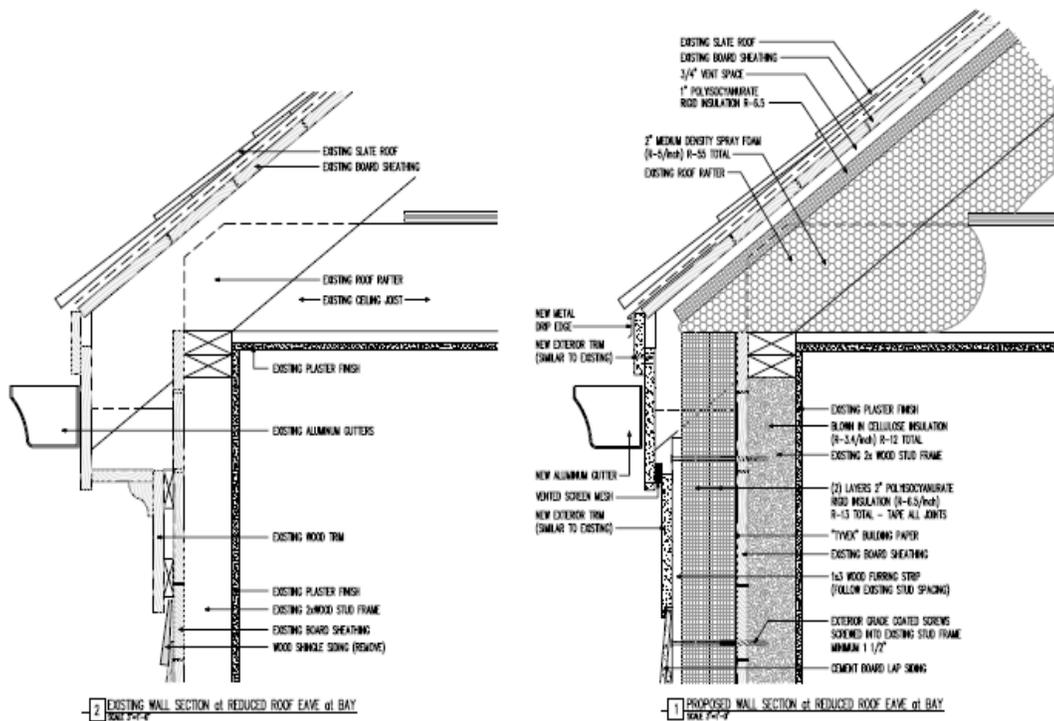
Details for roof/wall connections for Byggmeister Jamaica Plain house
